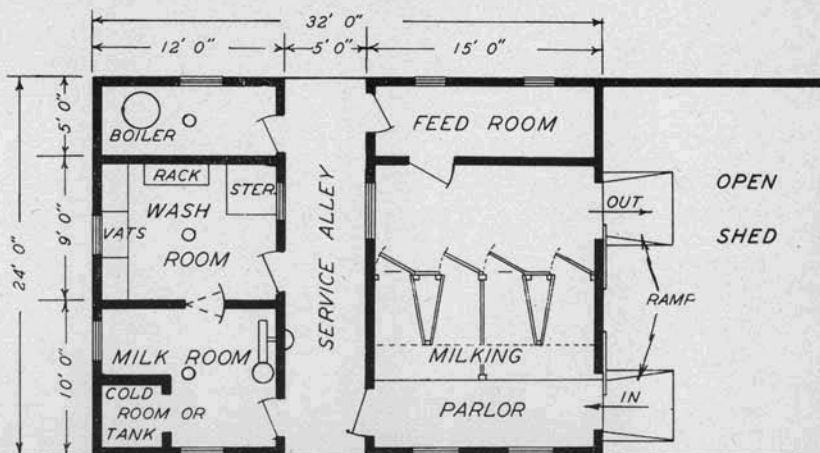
Combination milkhouse and milking parlor. (Plan .752-9)
